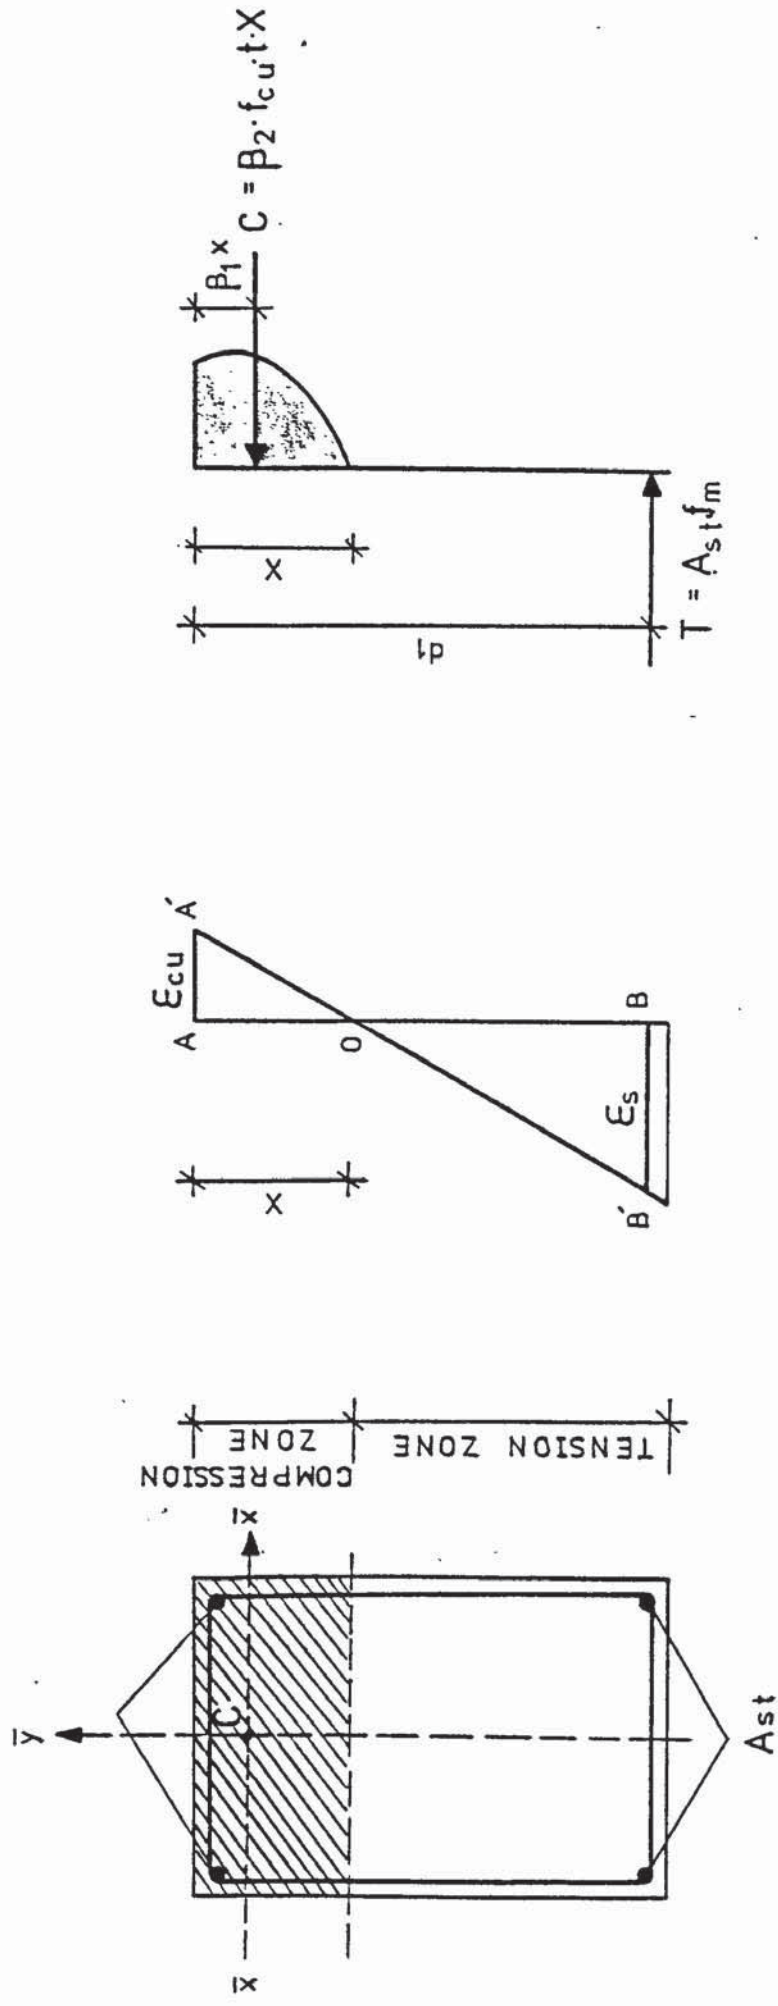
A REINFORCED CONCRETE SECTION AT FAILURE
